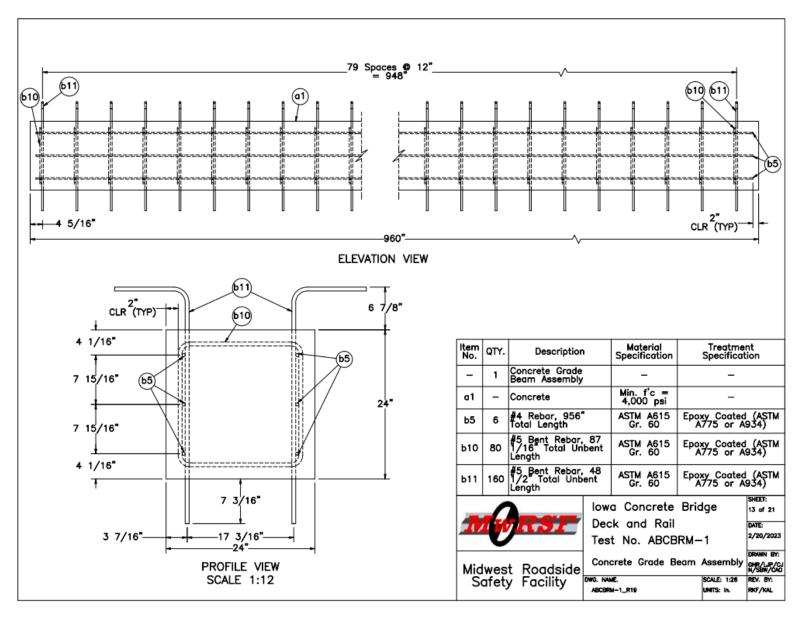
Concrete Grade Beam Assembly, Test No. ABCBRM-1
